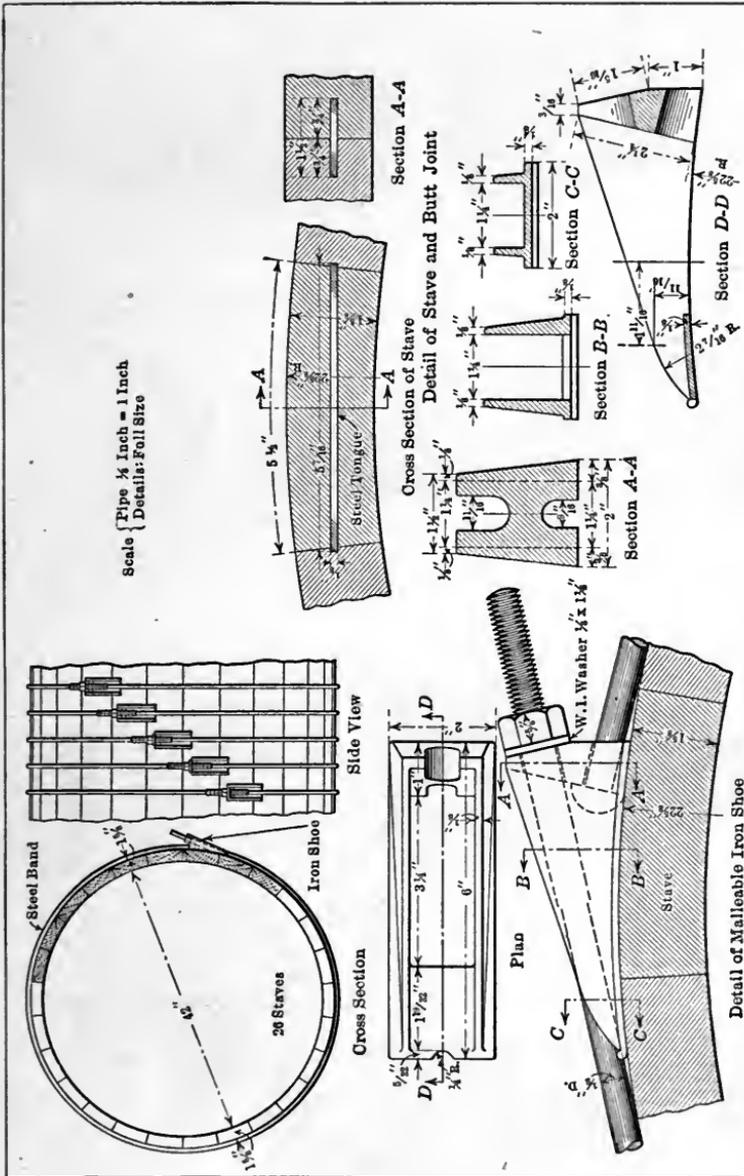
Details of continuous wooden stave pipe, Washington Pipe & Foundry Co., Tacoma, Wash.
